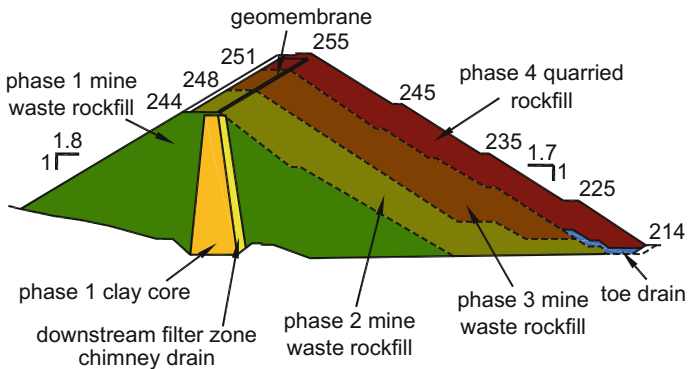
Staged construction using mine waste rock (Oliveira and Cambridge 2006)
